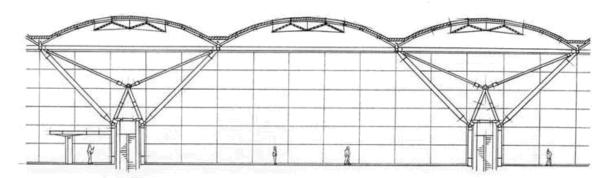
Cross-section through Stansted Airport (Image from BRE)
